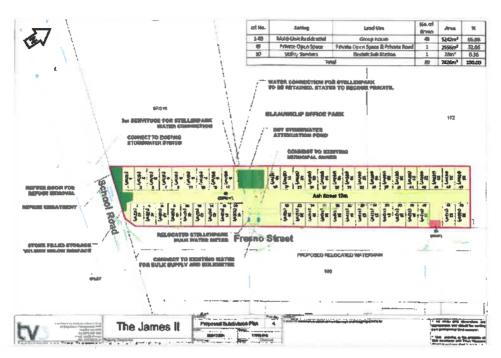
AMENDED SUBDIVISIONAL PLAN
